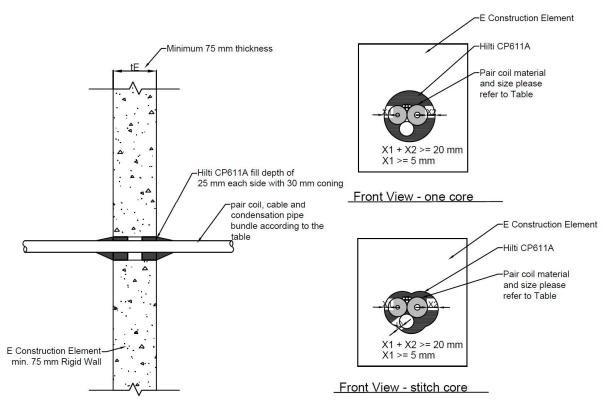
Single pair coil, cables and condensation pipes penetrating rigid wall
